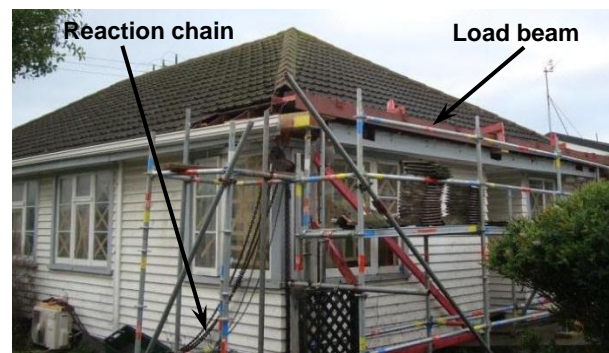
Load beam in place on west wall, reaction chain slack prior to loading, Bexley Rd. Photo: L. Holt
